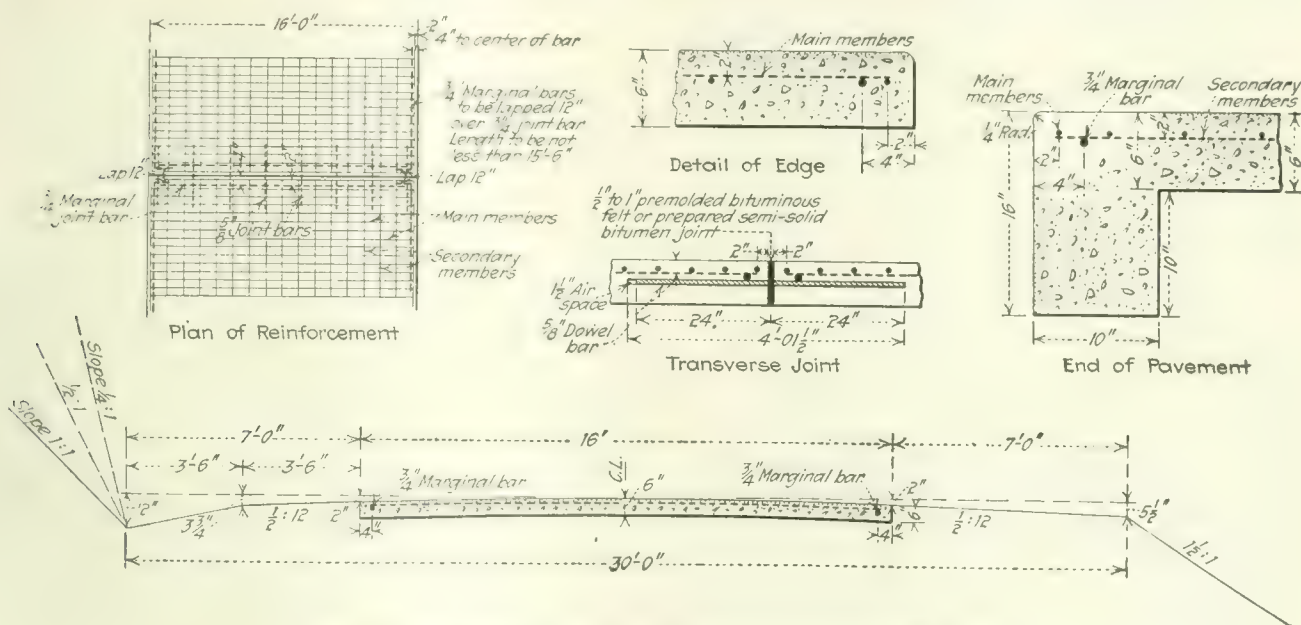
PAVEMENT SLAB AND REINFORCEMENT DETAILS
